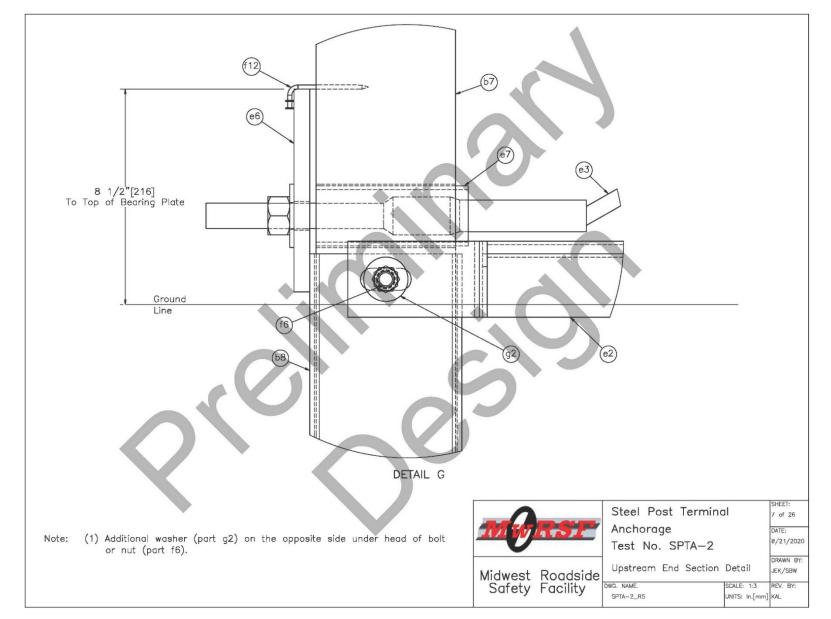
Upstream End Section Detail, Test No. SPTA-2
